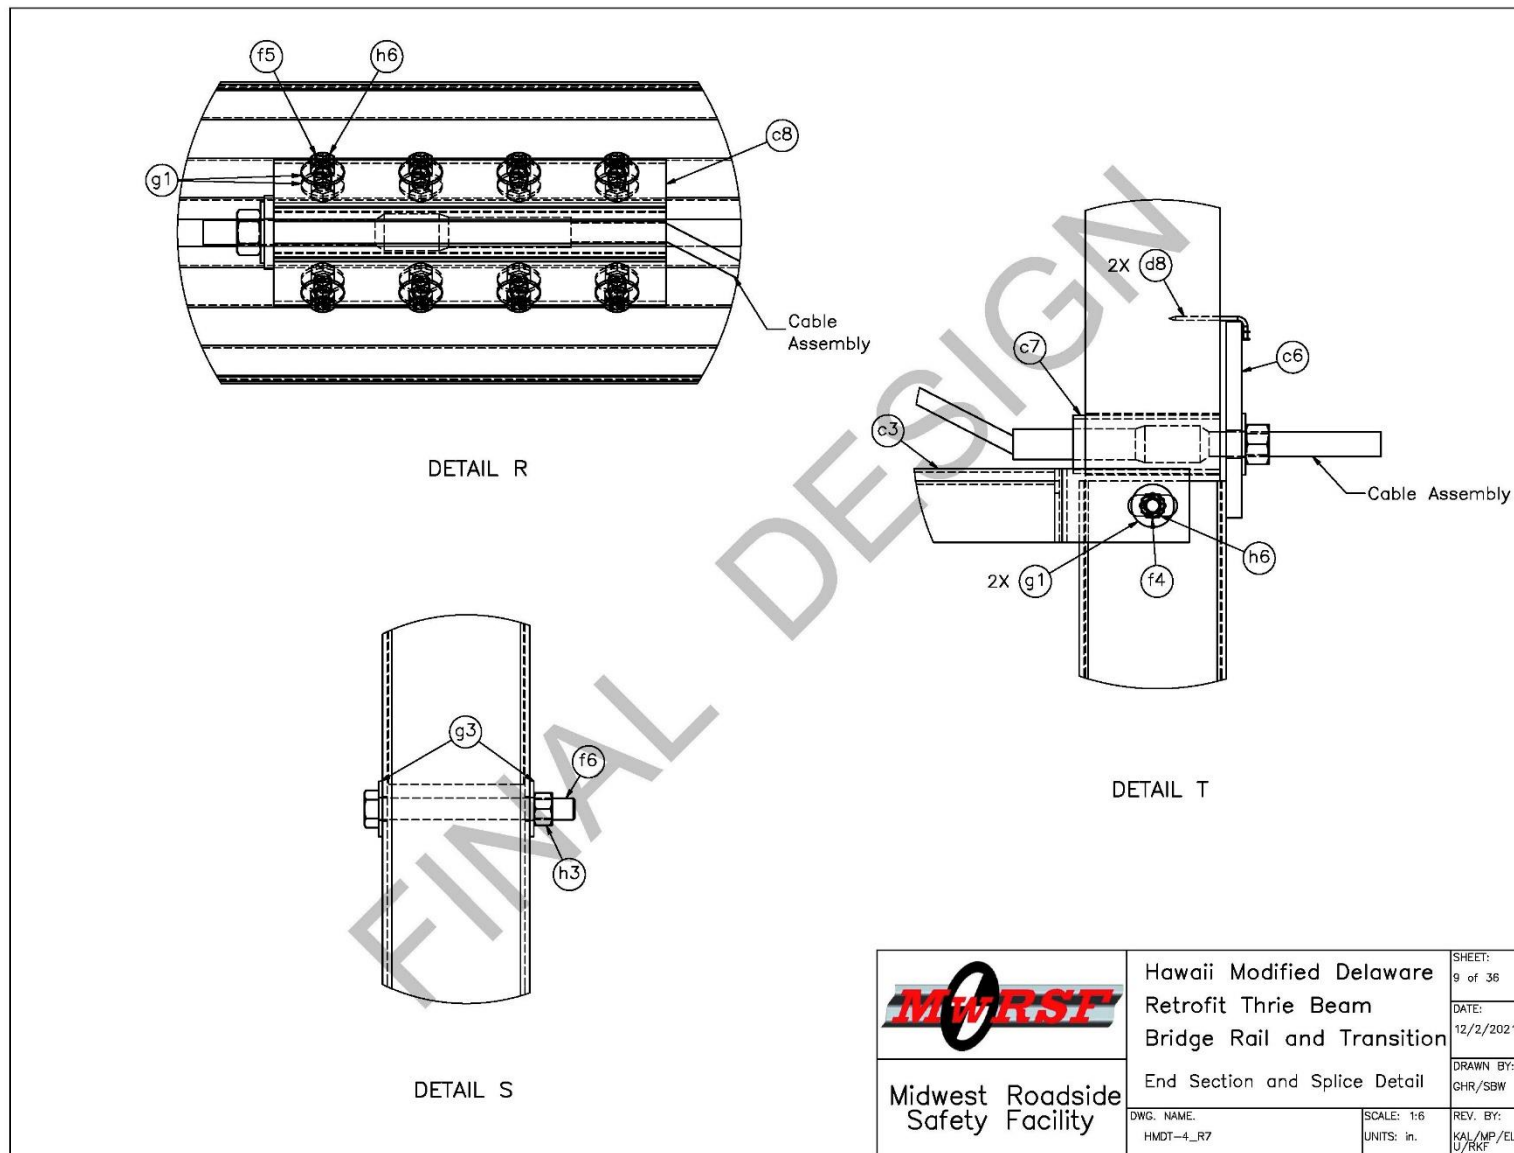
End Section and Splice Detail, Test No. HMDT-4
